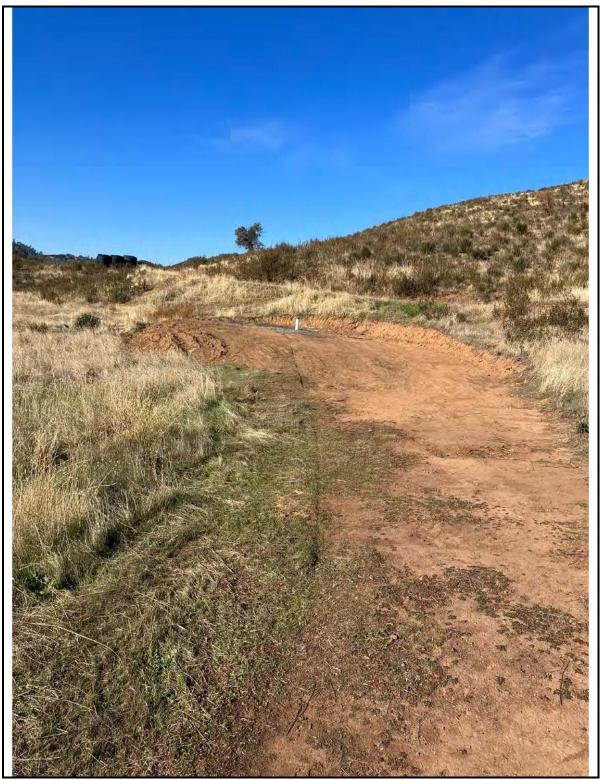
View of Site Well # 2 on APN: 136-071-02.
